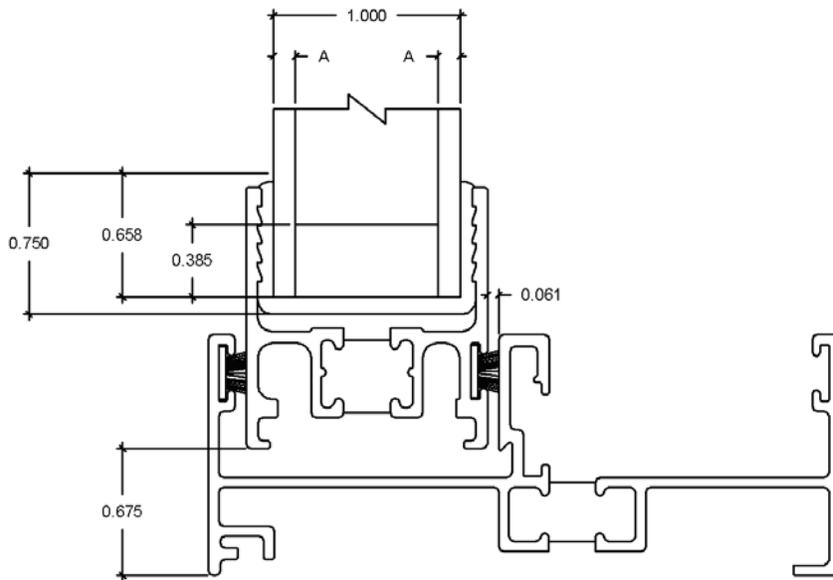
Dimensioned drawing for the jamb fixed cross section.
